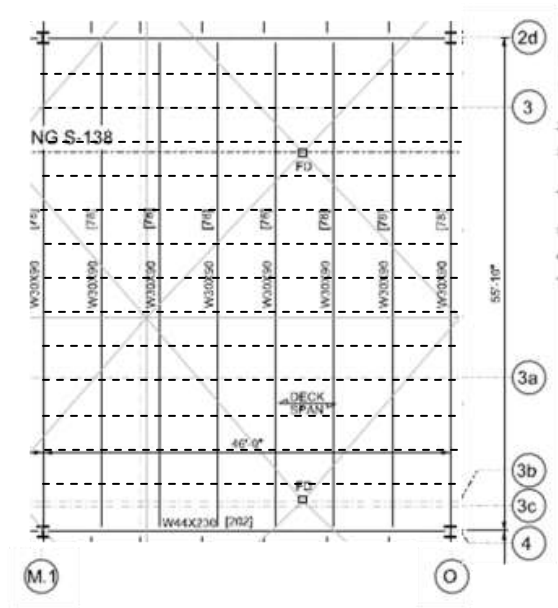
Typical Bay for Precast Hollow core Planks. Dashed lines indicate hollow core plank spans.
